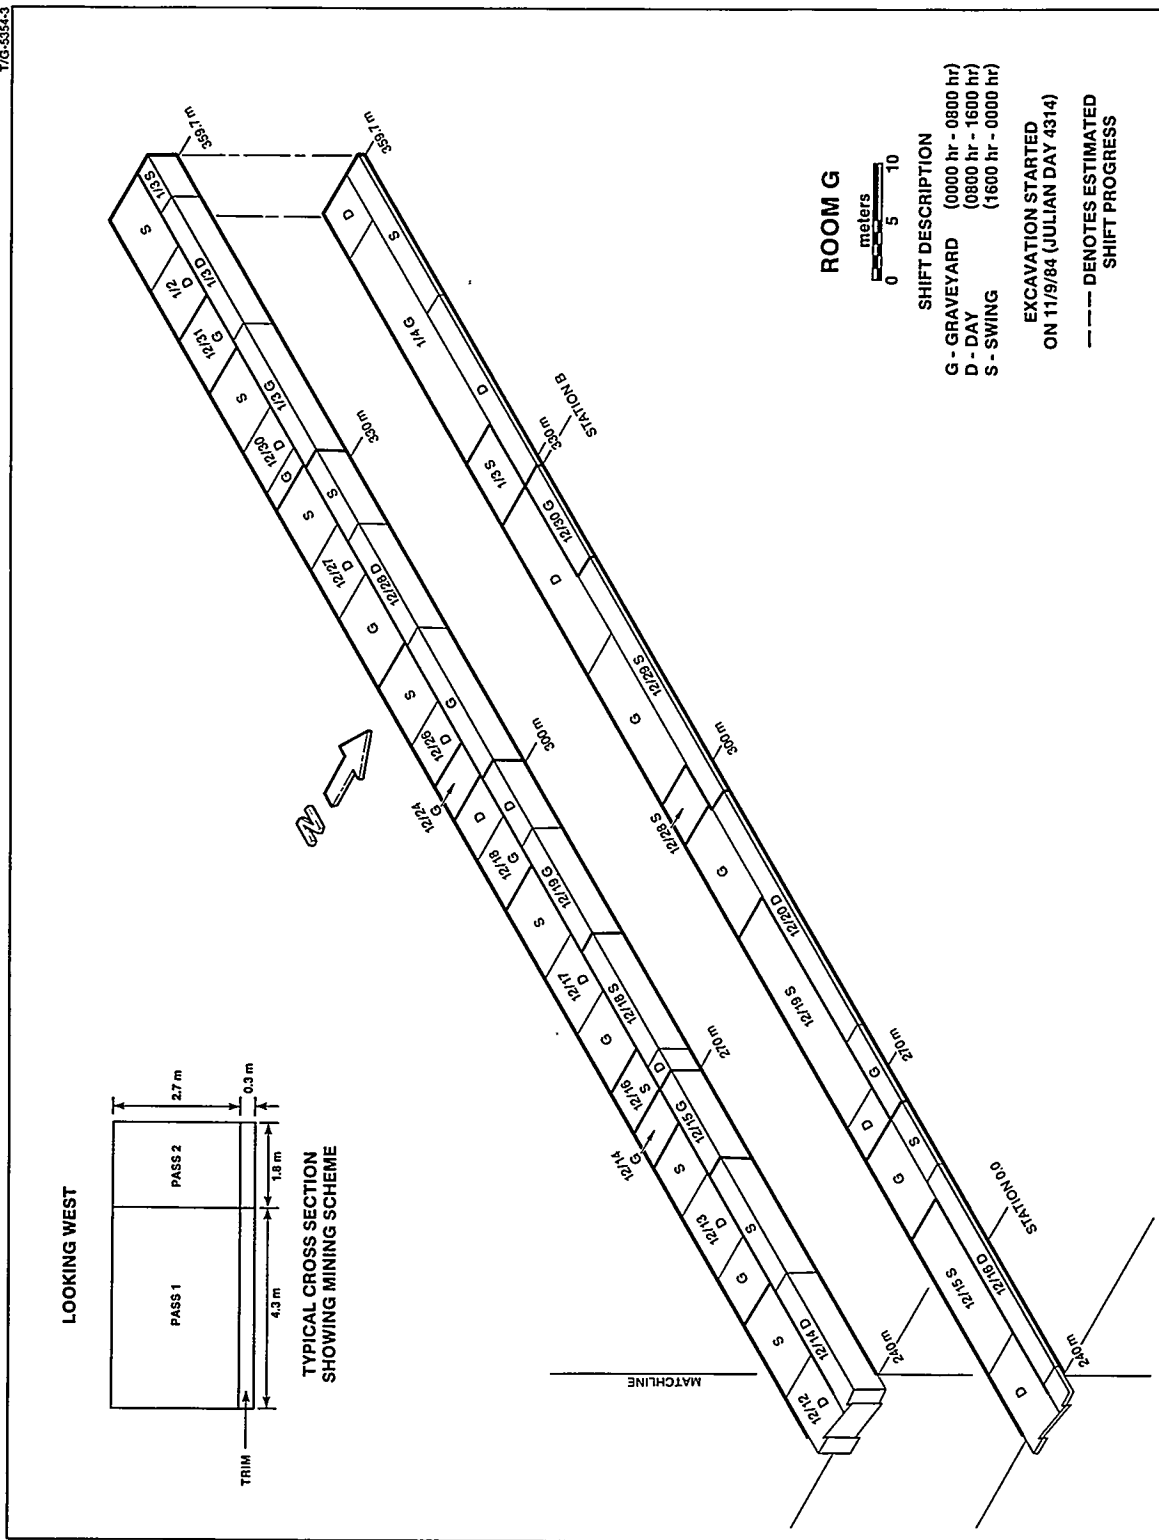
Isometric View of Excavation Progress, Room G, 3 of 3
